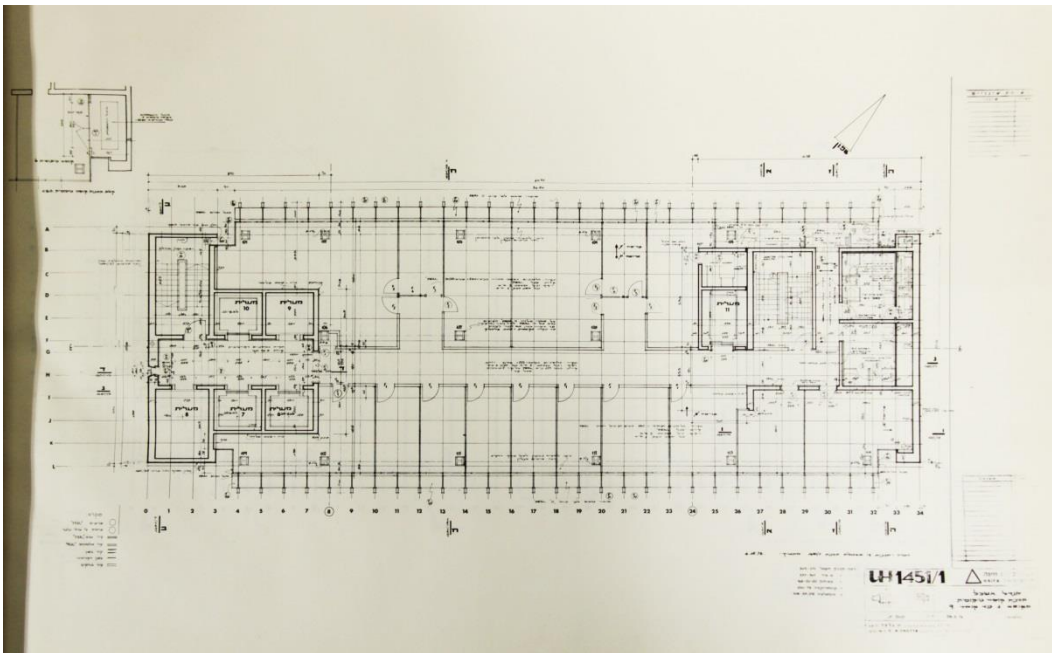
Typical floor plan of the Eshkol Tower by architect Shlomo Gilead as appeared in the March 1974 tender (University of Haifa Archive). The tower consisted of two service cores made out of reinforced concrete
